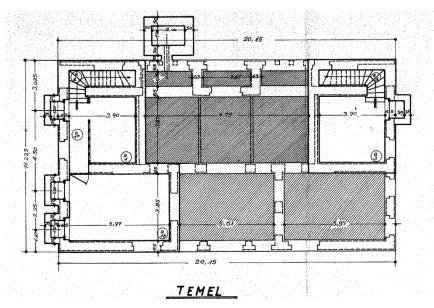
II^{nd} Class / Type III project / Foundation plan
